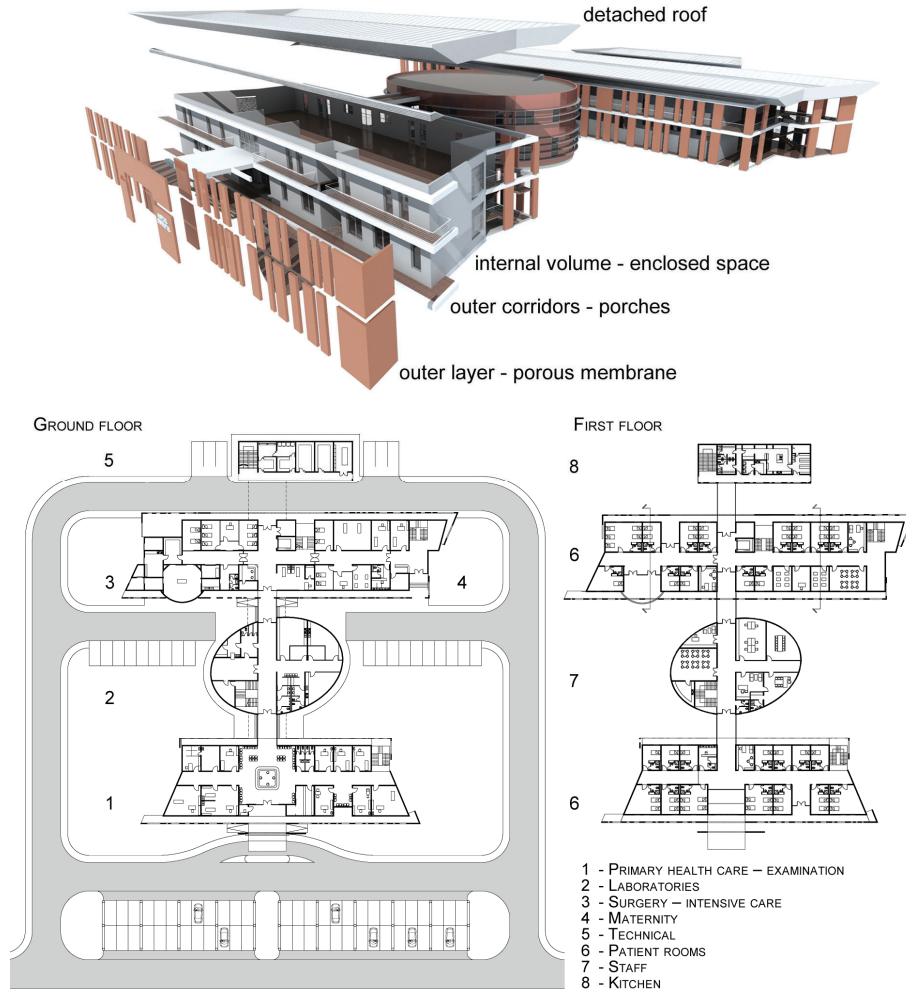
“Exploded perspective” of the Hospital building (top) and floor plans (bottom)
